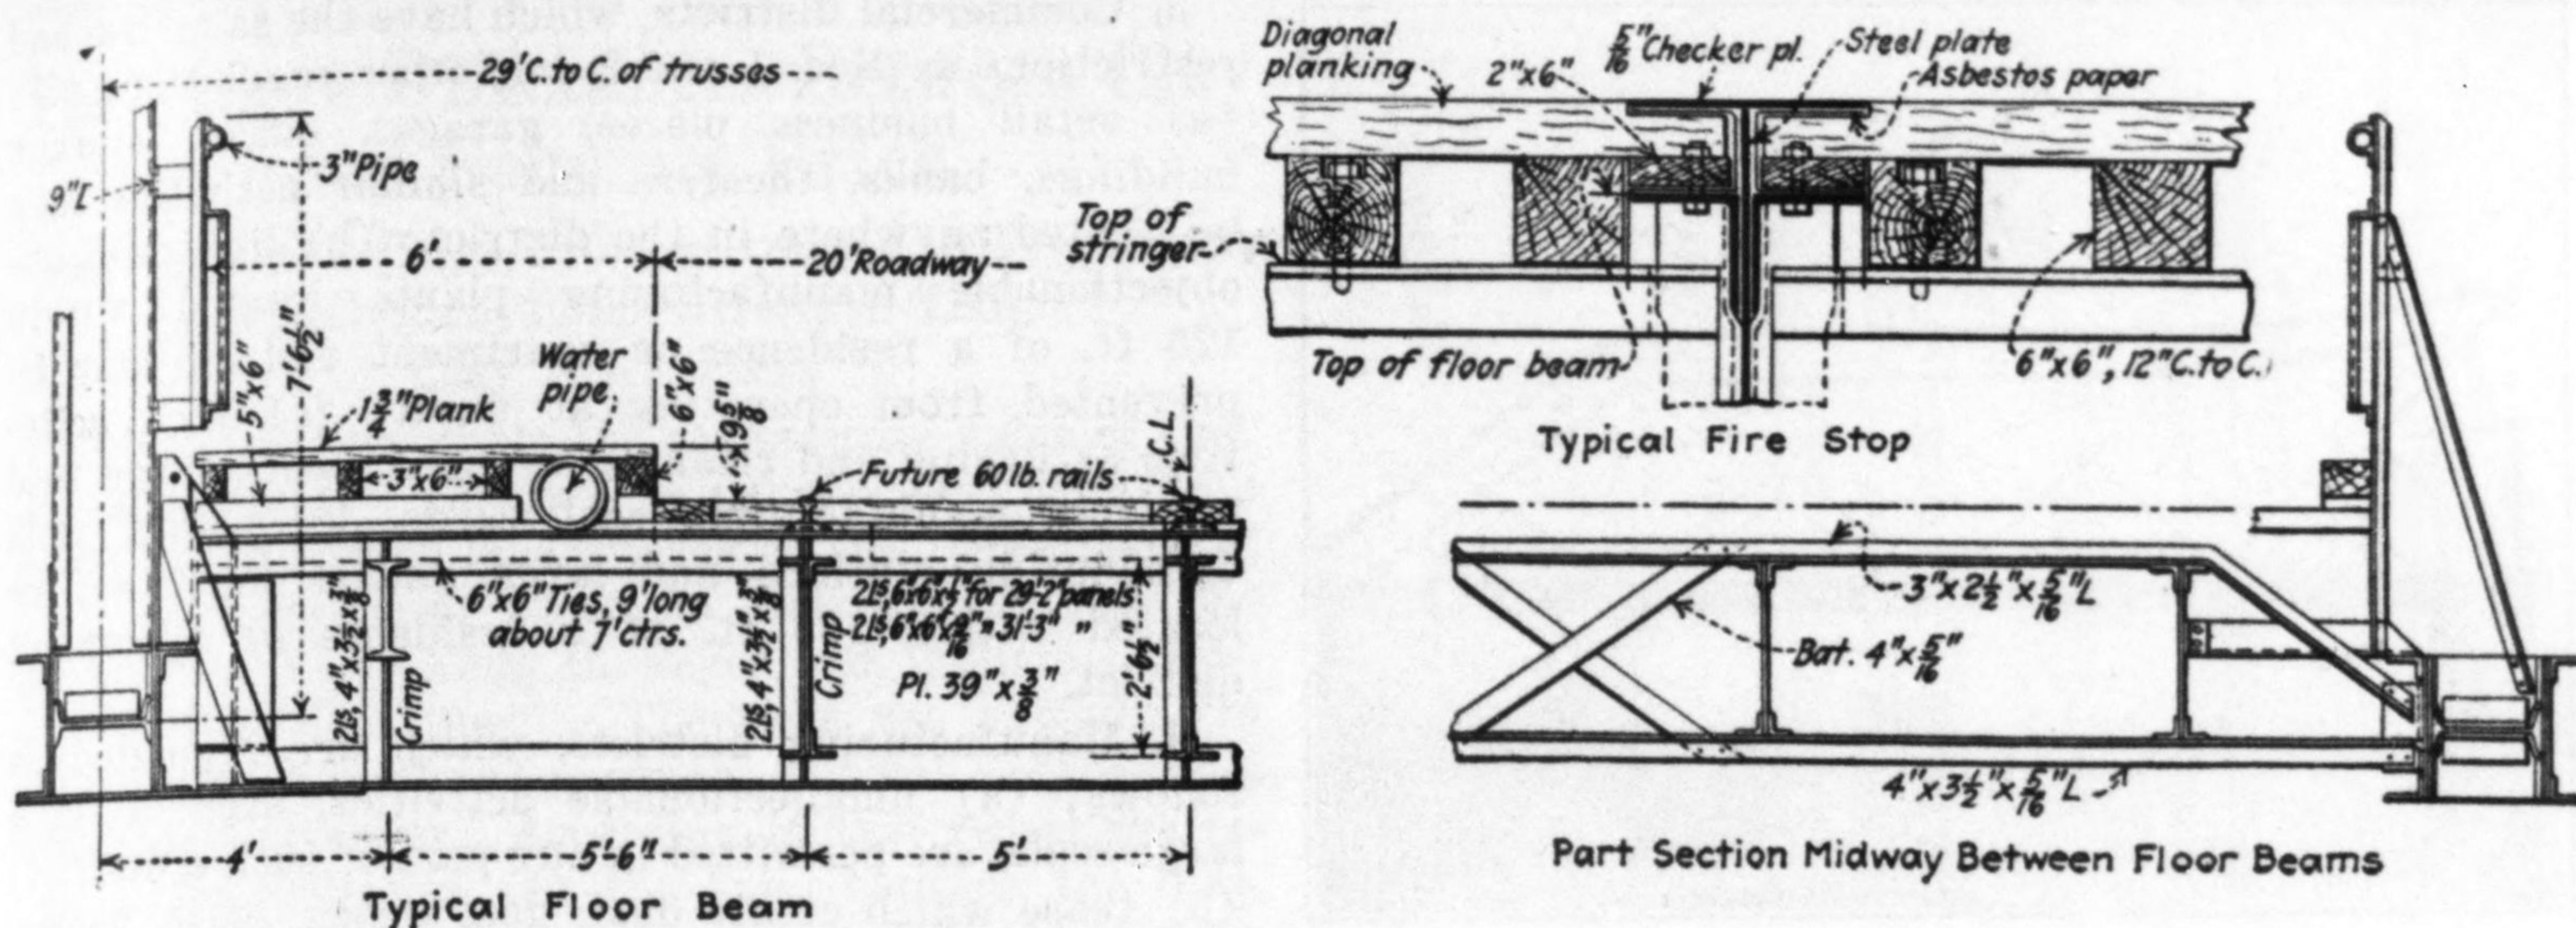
FLOOR FRAMING AND TIMBER DECK
